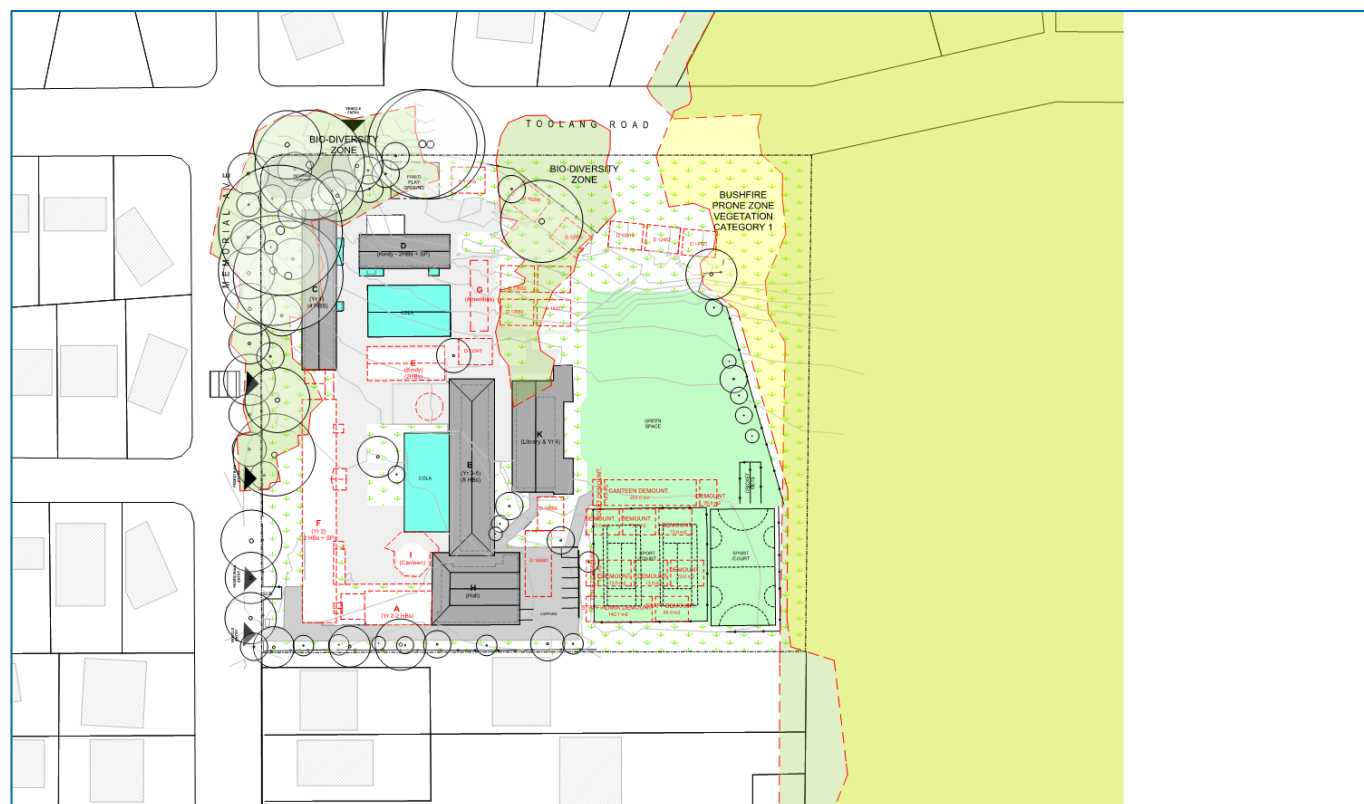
Proposed demolition plan (Schematic Design S.1 Preliminary, dated 7/6/2018, JDH Architects)
